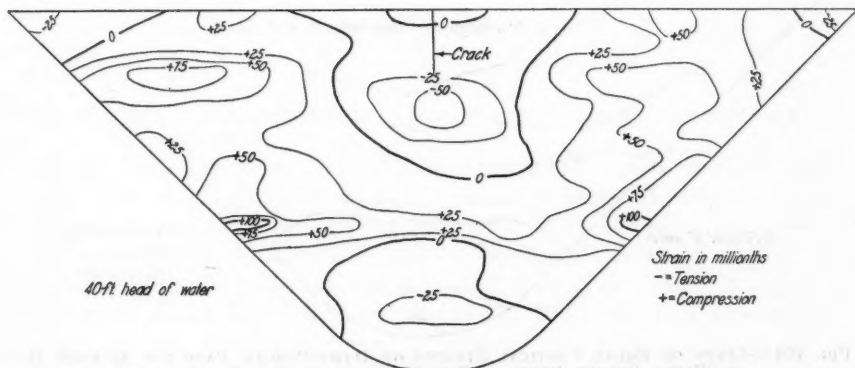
LINES OF EQUAL HORIZONTAL STRAINS ON DOWN-STREAM FACE FOR 40-FOOT HEAD OF WATER AFTER VERTICAL CENTER CRACK AT TOP HAD OCCURRED.
